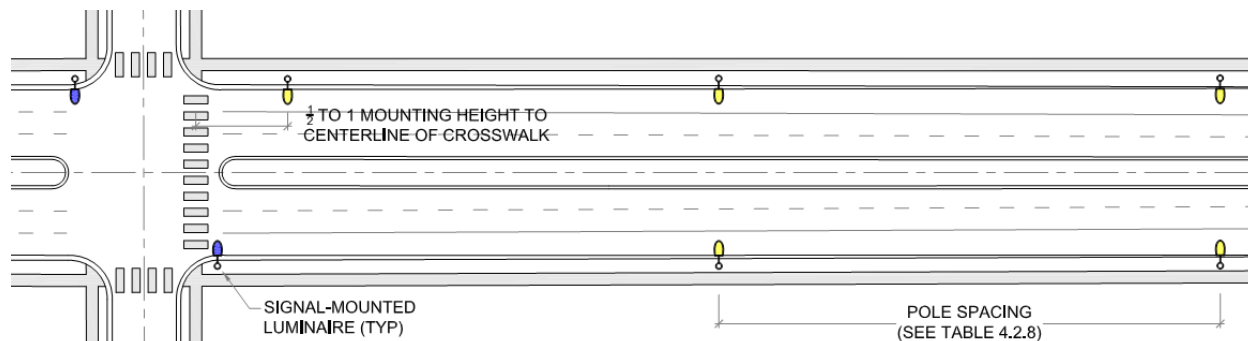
Typical Four Lane Arterial with Parking (non-median mounted) Street Cross Section
